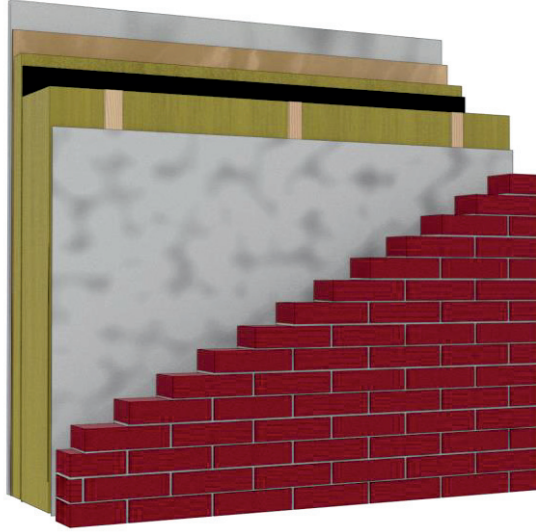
Schematic of a timber frame wall with brick veneer (total thickness of ~ 415 mm). Layers from the right side (exterior): brick masonry veneer (120 mm), air gap (30 mm), gypsum board (16 mm), wood fiber insulation (170 mm), vapor retarder, wood fiber insulation (50 mm), oriented strand board – OSB (12 mm), and gypsum board (16 mm) [150]
